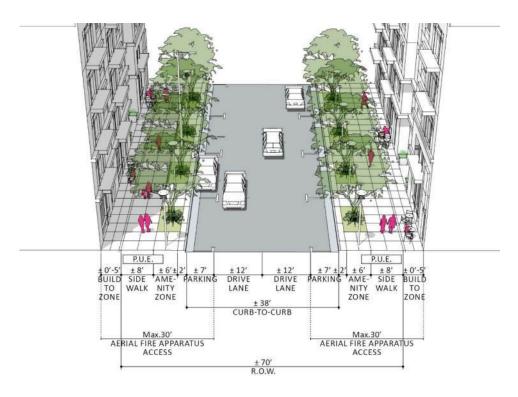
Mixed-Use Street 1: adjacent to Commercial Ground Floor Use with fire access
